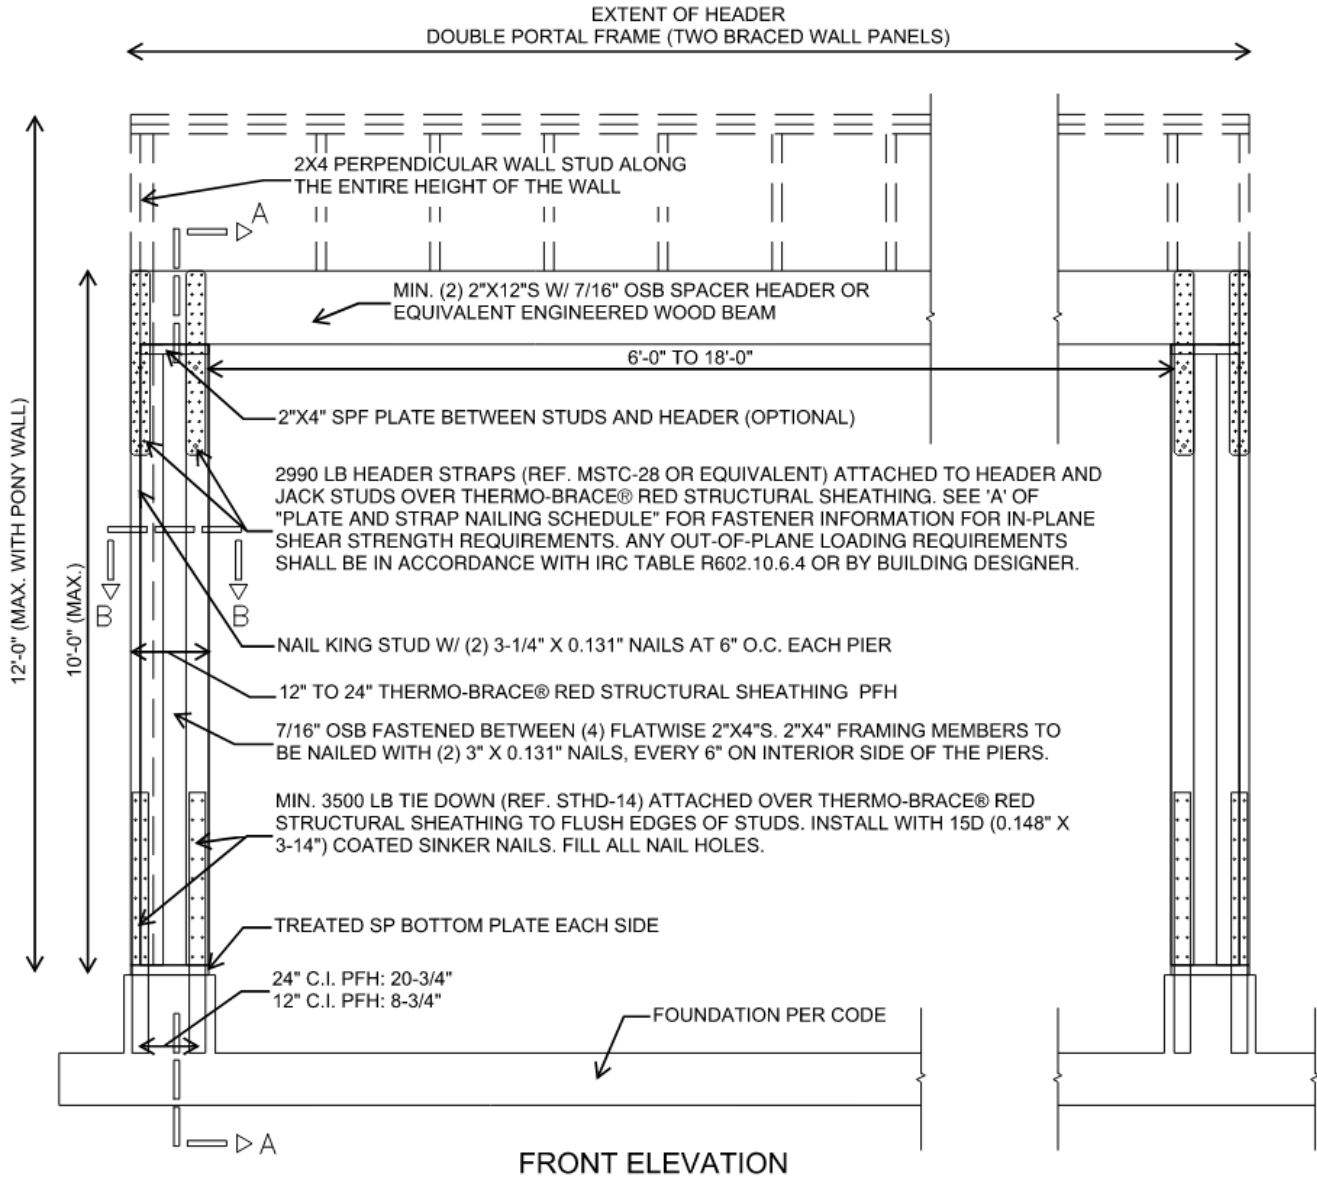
CONSTRUCTION DETAILS OF THERMO-BRACE® RED STRUCTURAL SHEATHING 12" TO 24" PFH
